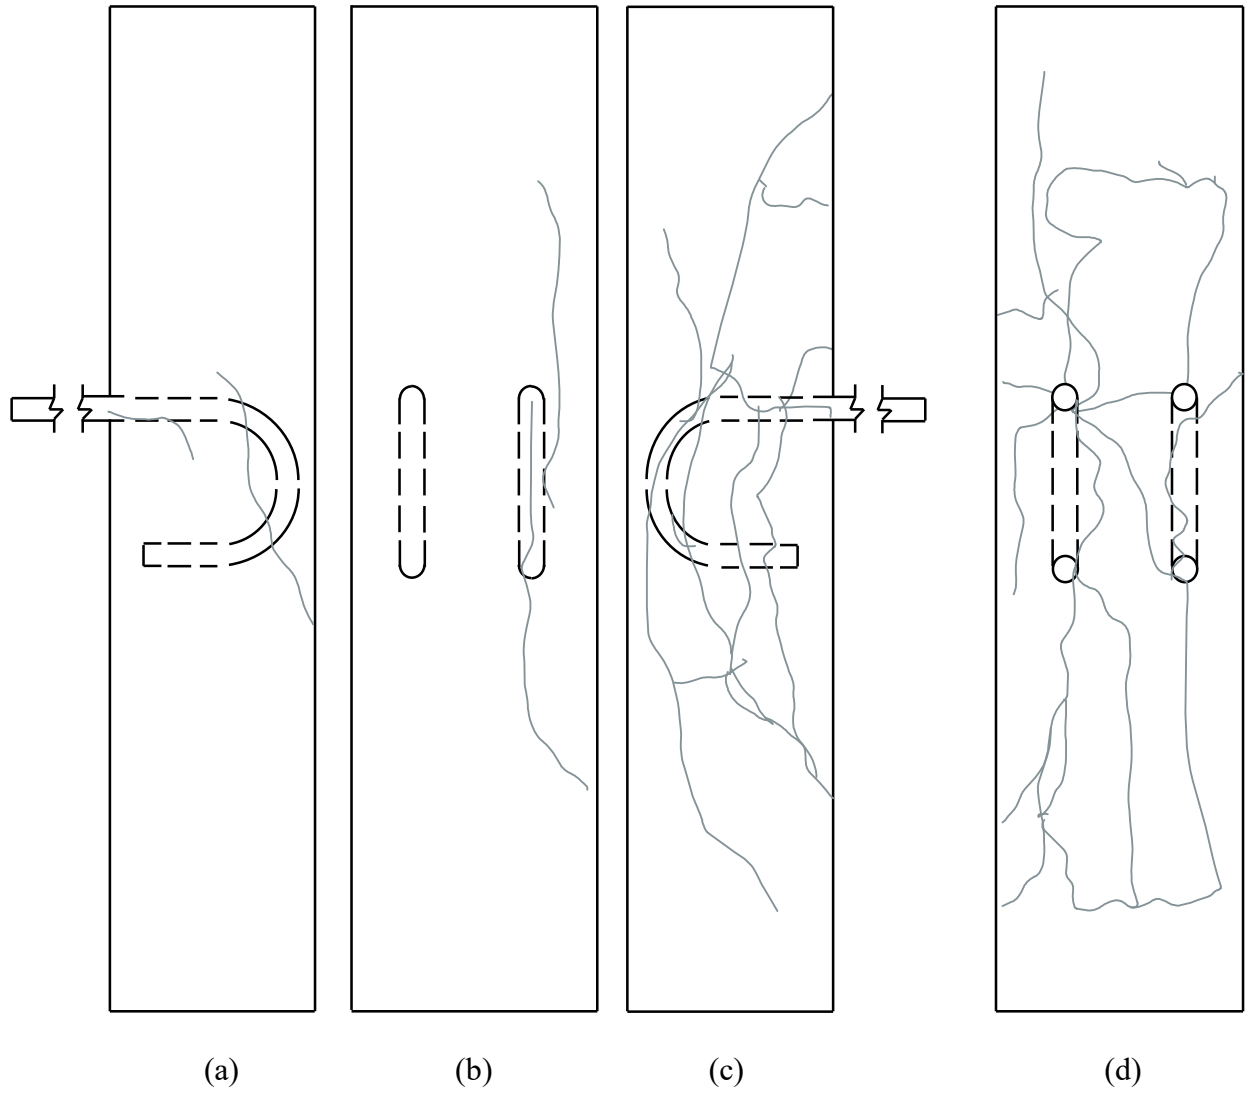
Crack pattern at maximum normalized tensile load for beam-column joint specimen P4-180 which was deemed an outlier: (a) west side face, (b) back face, (c) east side face, and (d) front face
